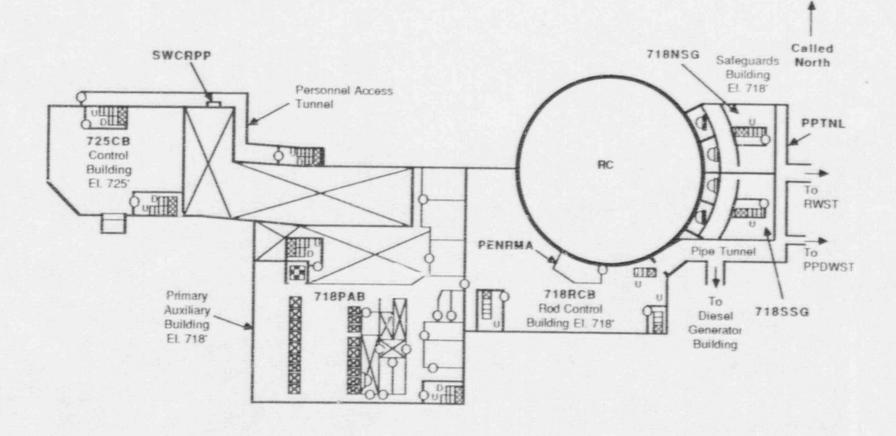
Beaver Valley 2 Reactor Containment, Crintrol Building, Primary Auxiliary Building, Safeguards Building, and Rod Control Building (Elevation 718'6")
